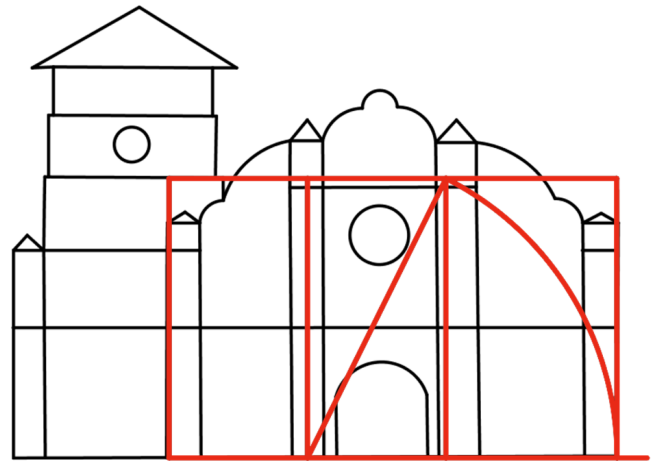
Geometric construction to verify golden rectangle in Pan-ay Church facade.
